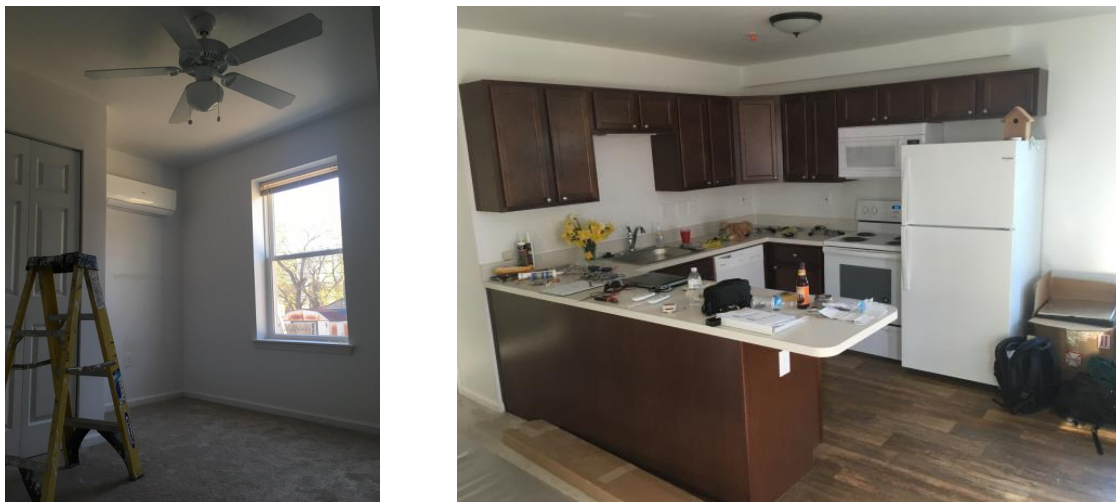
Maryland home bedroom with ceiling fan and heat pump fan coil (left); kitchen (right)
